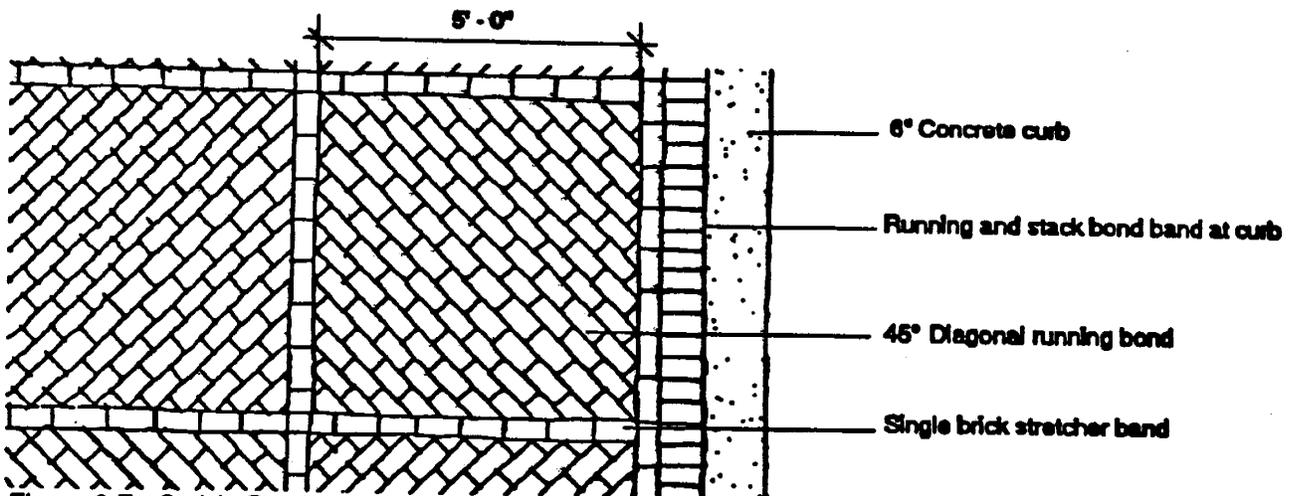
Carlyle Precinct Standard Sidewalk Paving in Square Area
